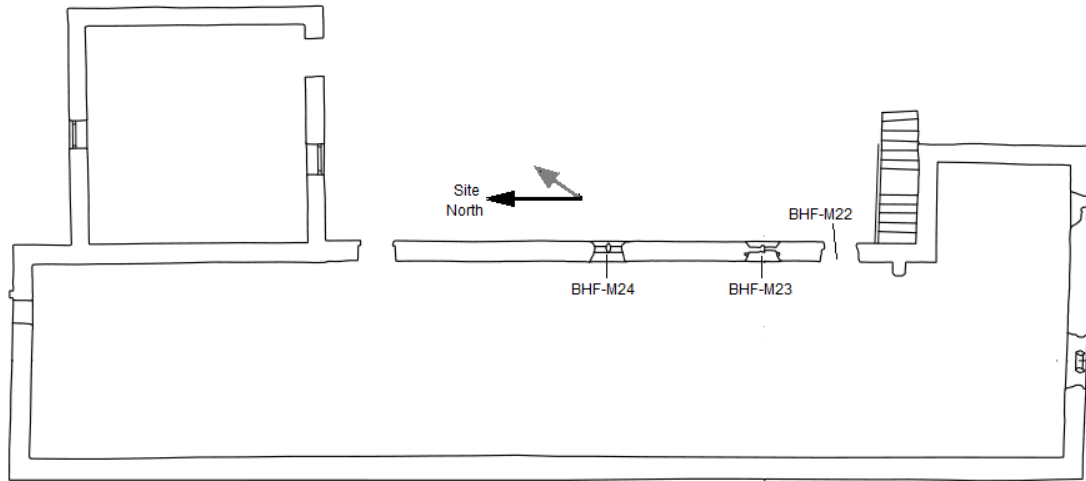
Ground-floor plan also showing the location of sampled timbers BHF-M22–24 (Archeritage)
